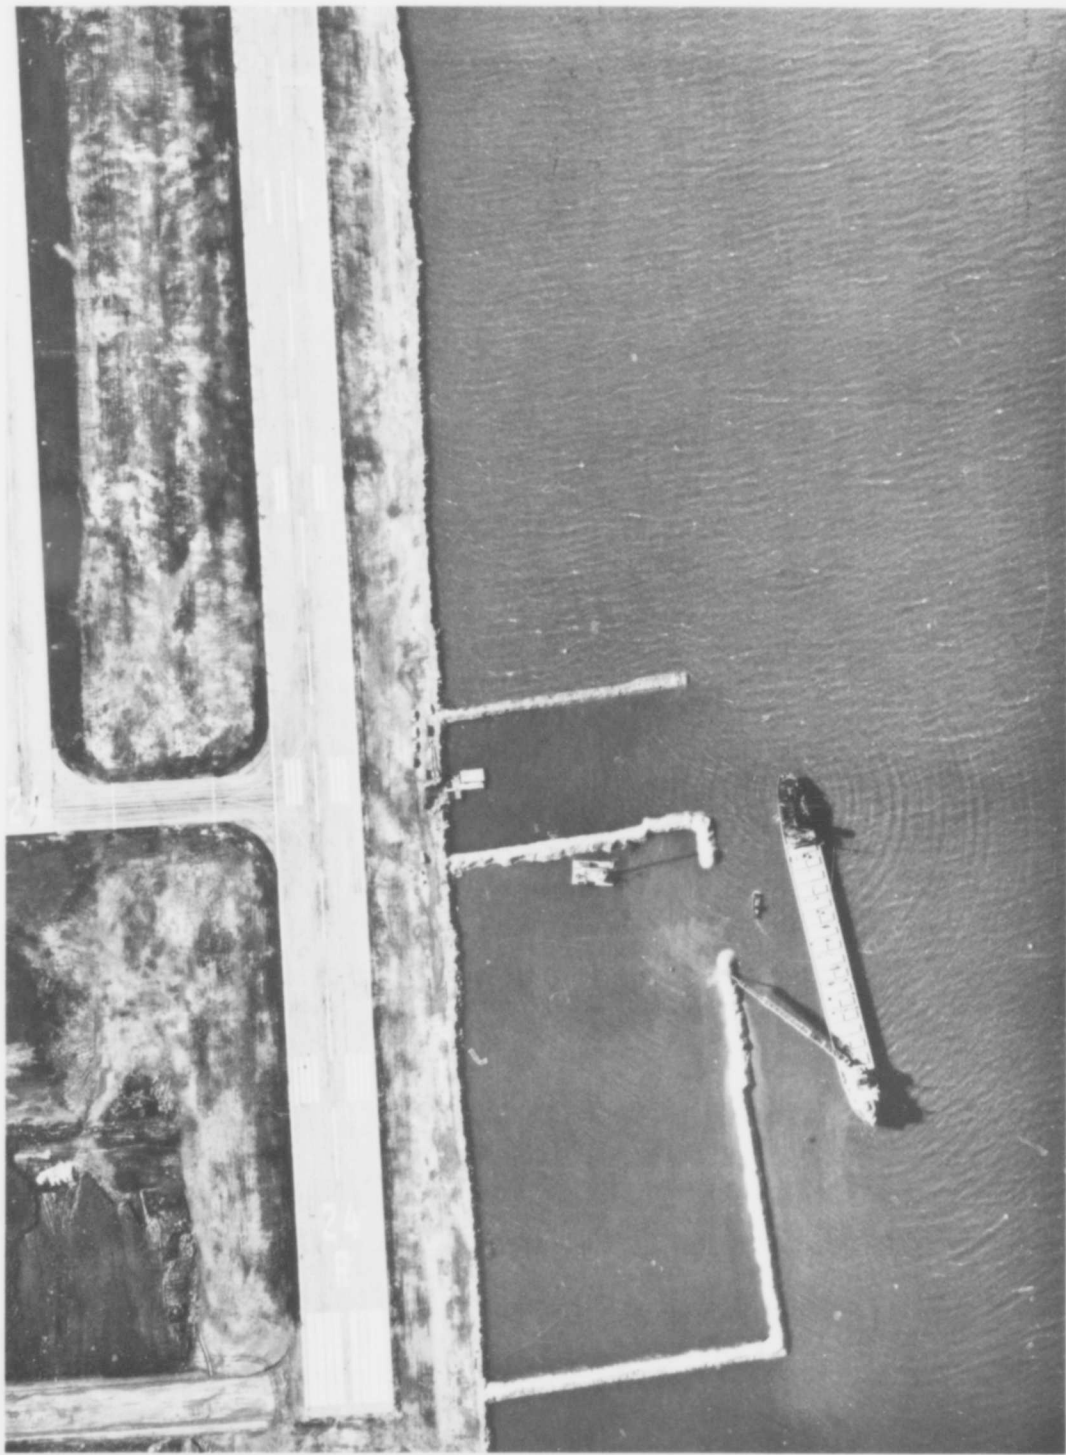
Cleveland Diked Disposal Area Under Construction In 1967
